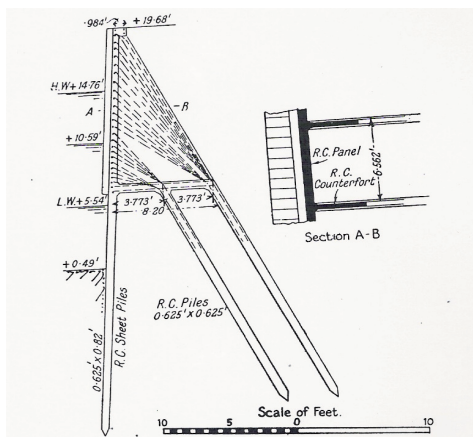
Cross-section of reinforced concrete panel wall at Termonde, Belgium 1905 [Duplat Taylor 1949]
